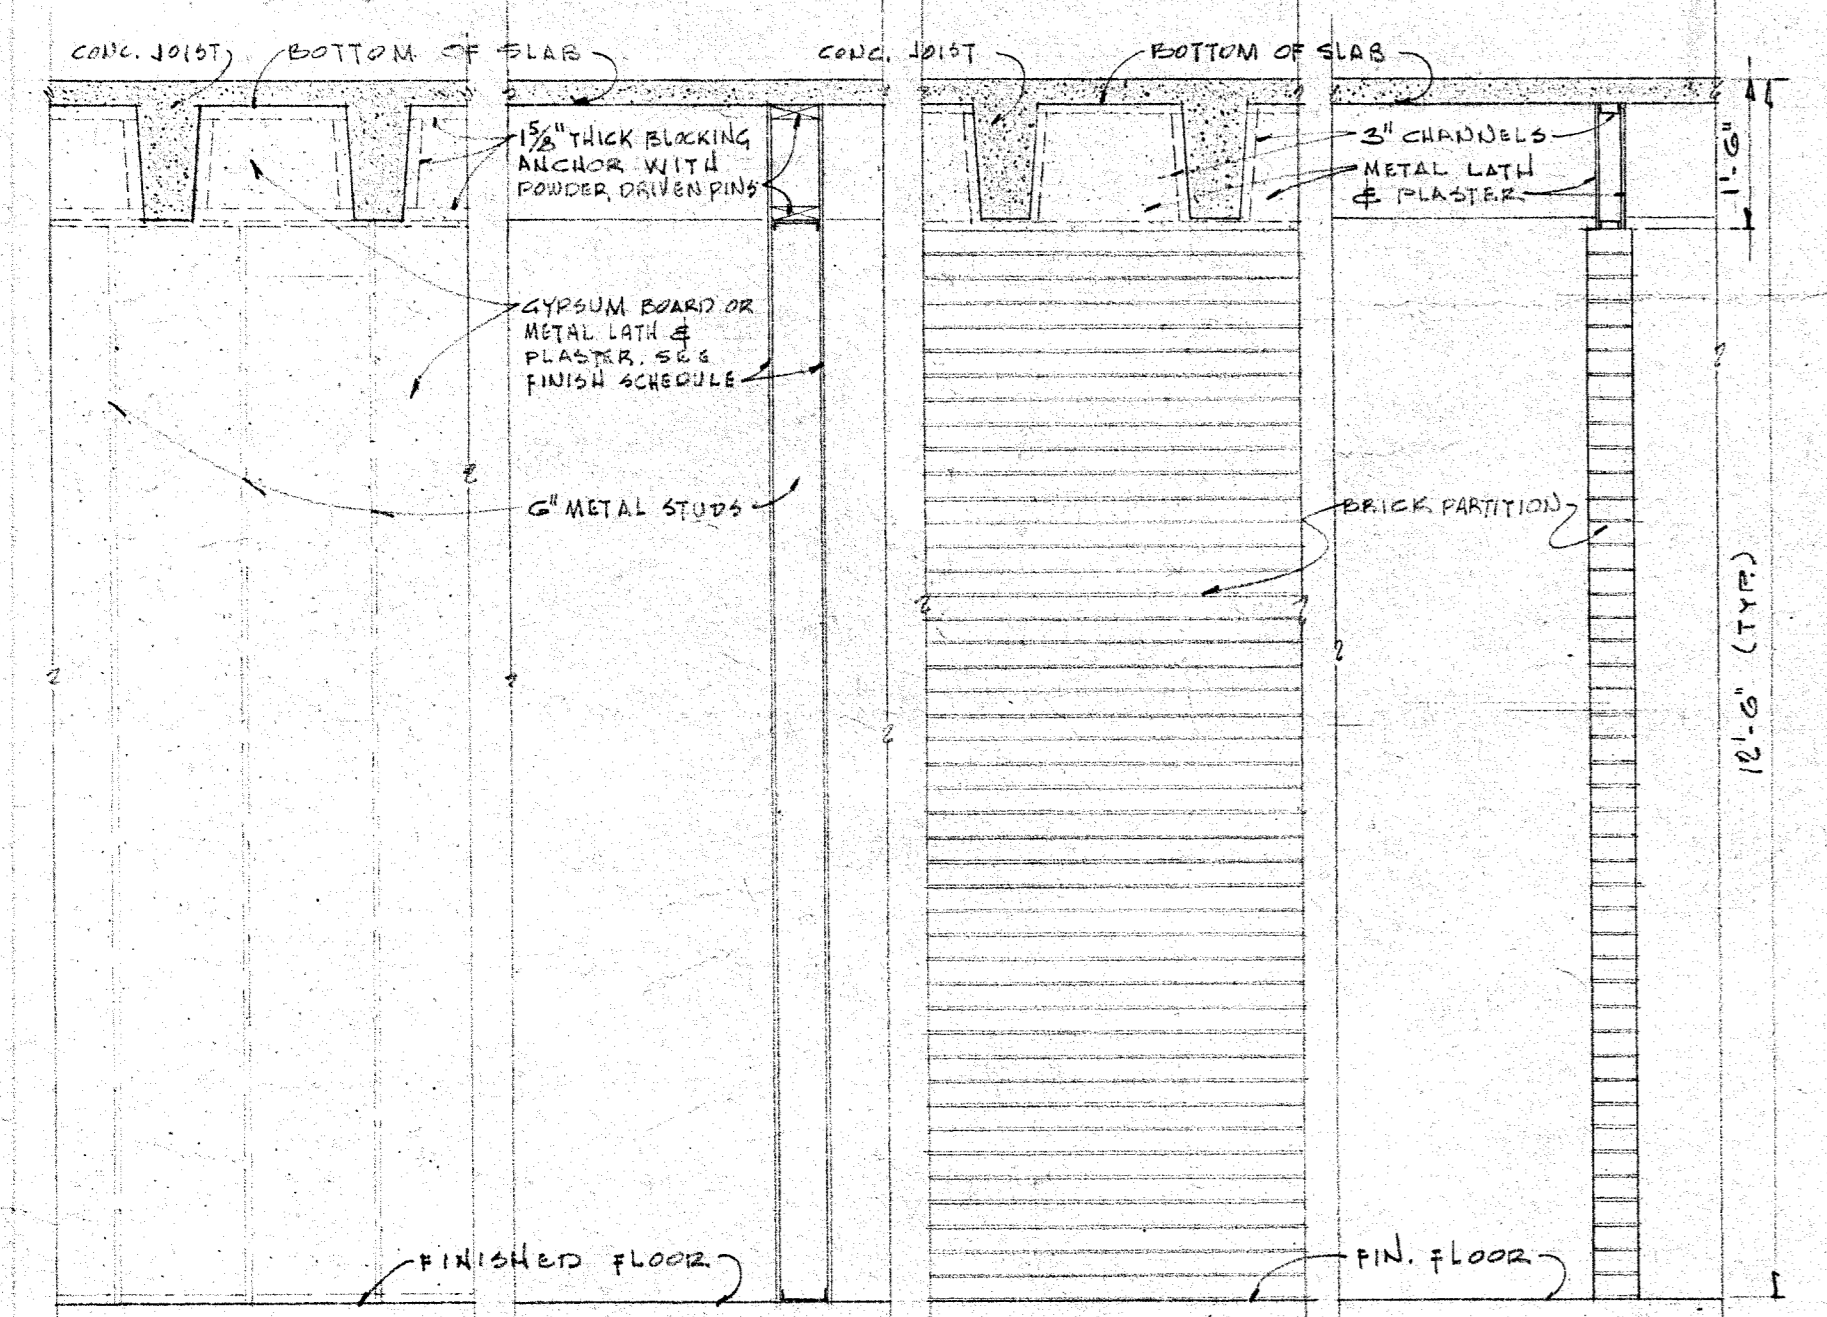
DETAILS OF INTERIOR PARTITIONS PARALLEL TO CONCRETE JOISTS
